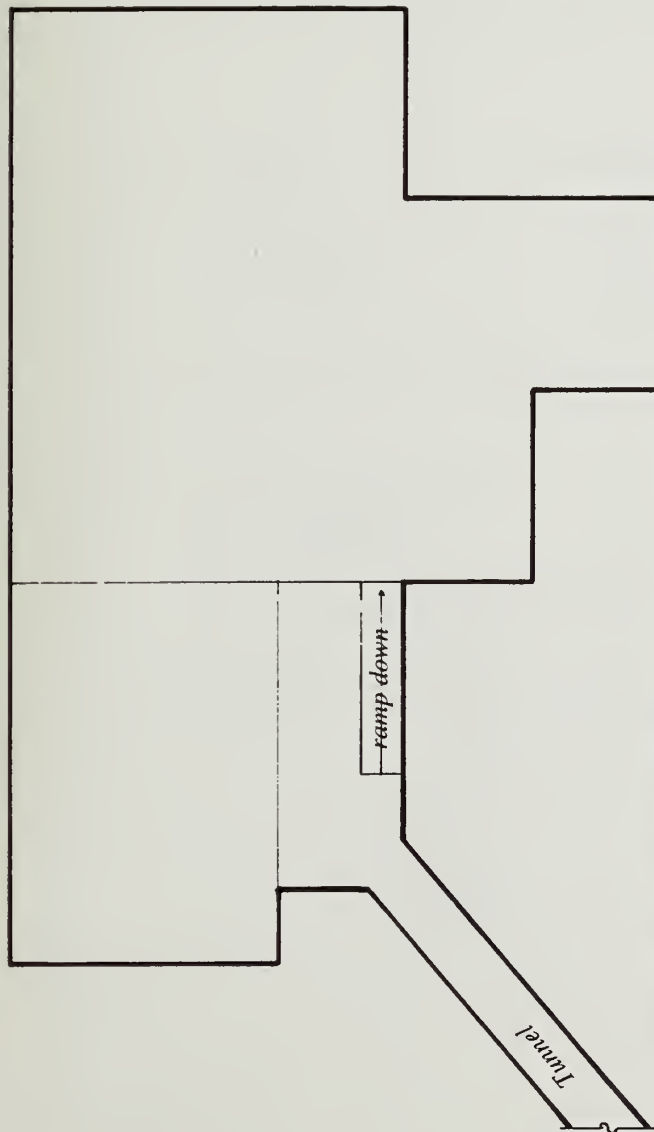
SPACE ALLOCATION PLAN: MAIN FLOOR
